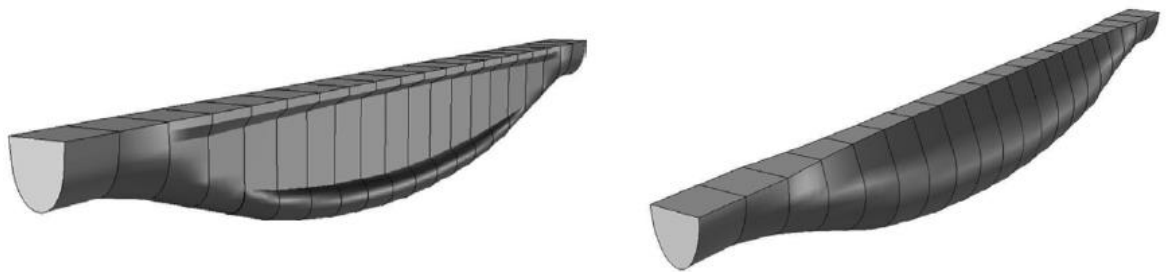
Shape optimised fabric-formed beams by (Garbett et al., 2008)
